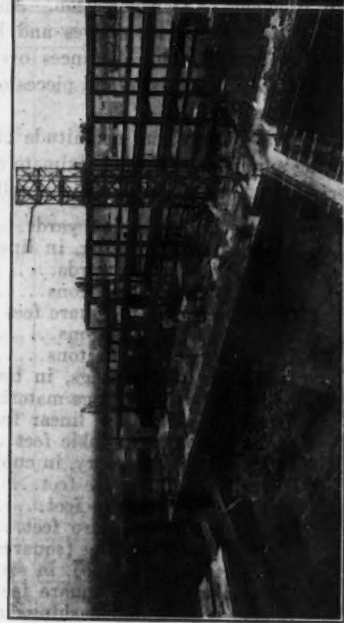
CHEMICAL BUILDING STEEL WORK ERECTED
